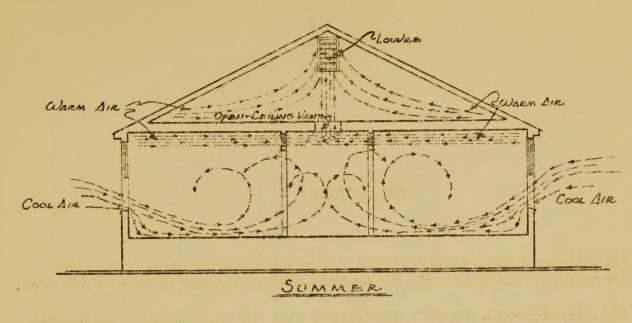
DETAIL OF CONSTRUCTION OF WELL-BUILT F.S.A. HOUSES.
